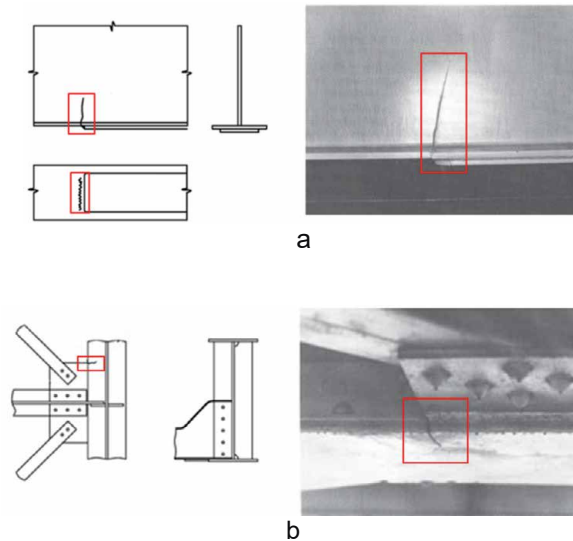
a) Fatigue crack at the end of a welded steel plate; b) crack in a difficult-to-reach area of a gusset.
